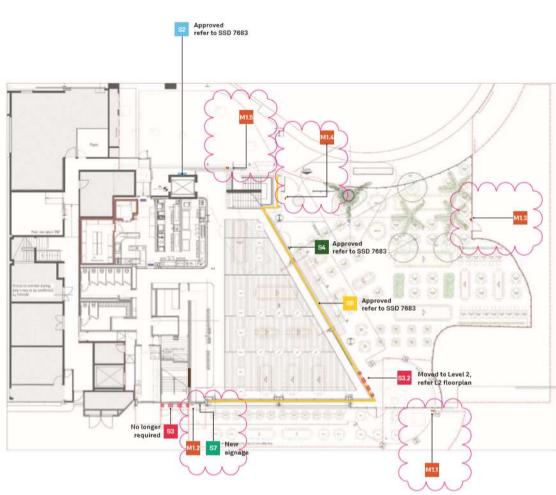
Proposed Level 1 floorplan amendments (Source: Mantle Group)
